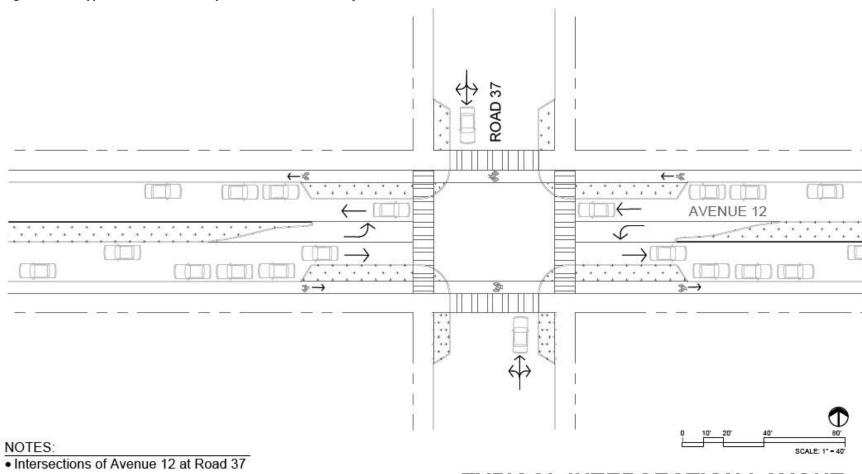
Typical Intersection Layout: Avenue 12 at Major Side Road
